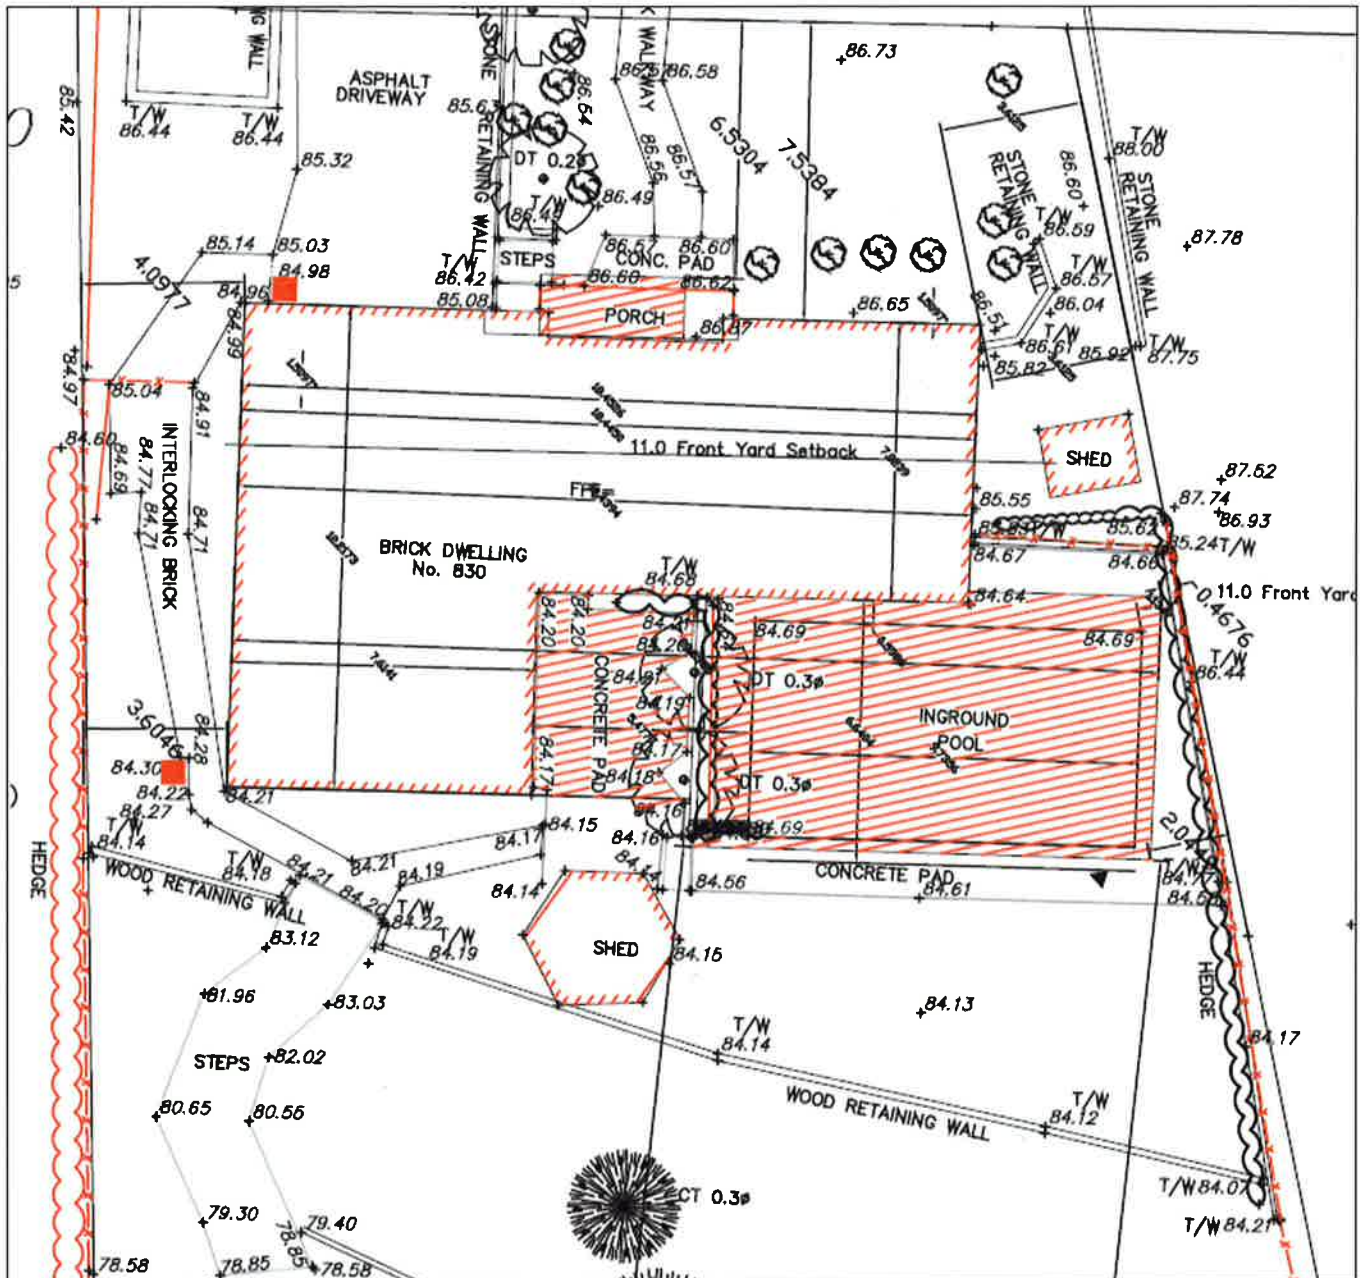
Site plan showing proposed second floor addition and pool enclosure
